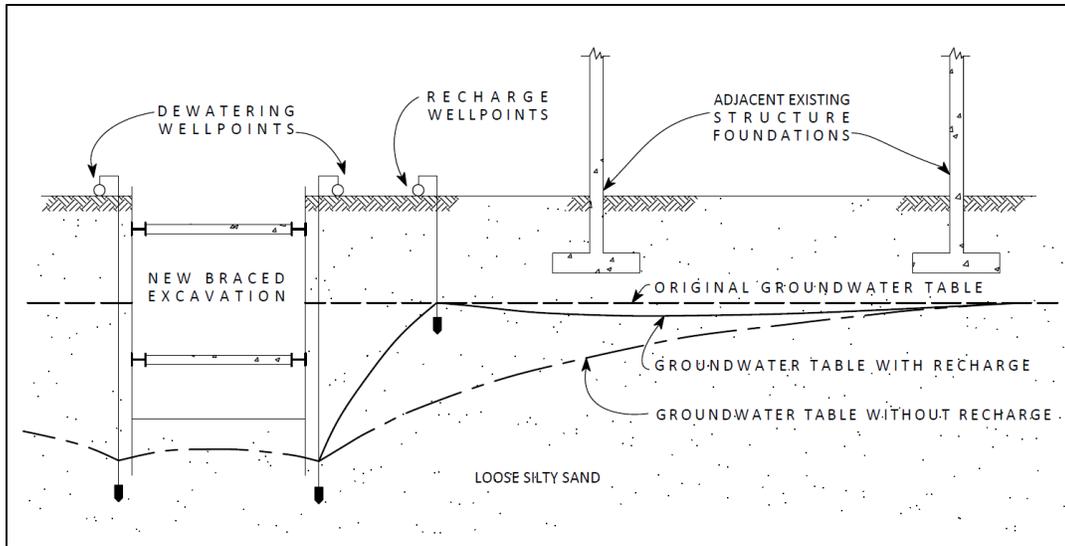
Recharge of groundwater to prevent settlement of a building as a result of dewatering operations (Adapted from TM 5-818-5)
